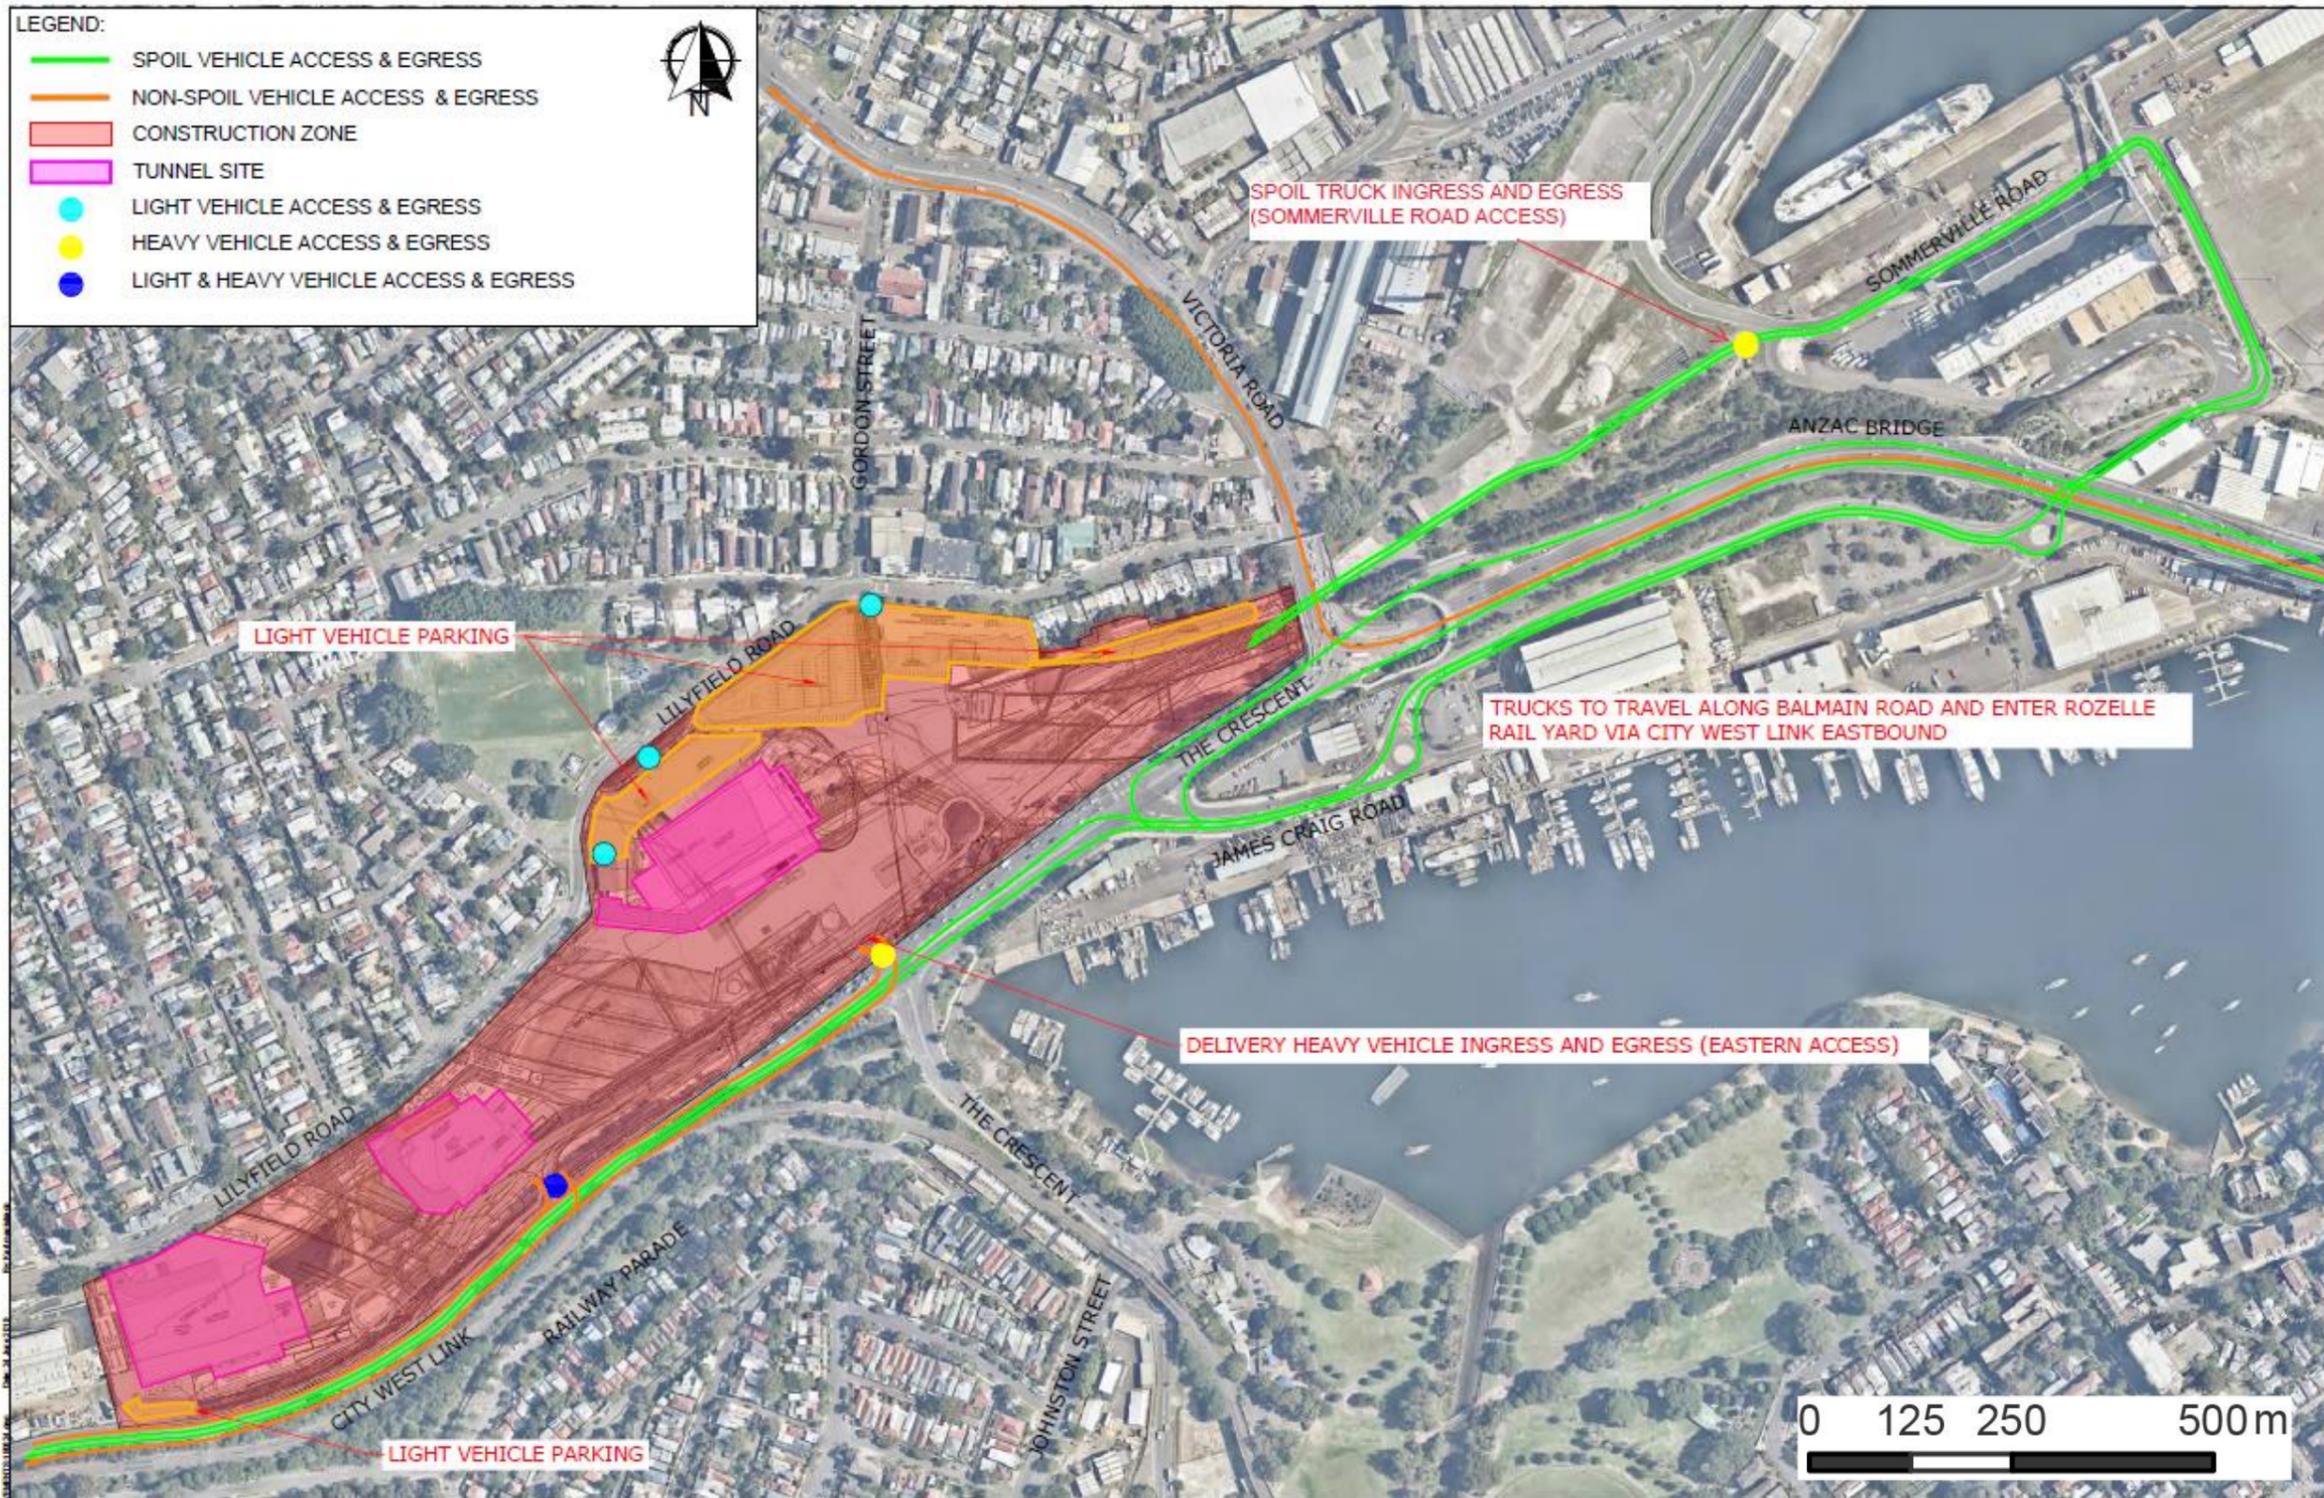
Haulage Routes via the Rozelle Civil and Tunnel Site (C5)
